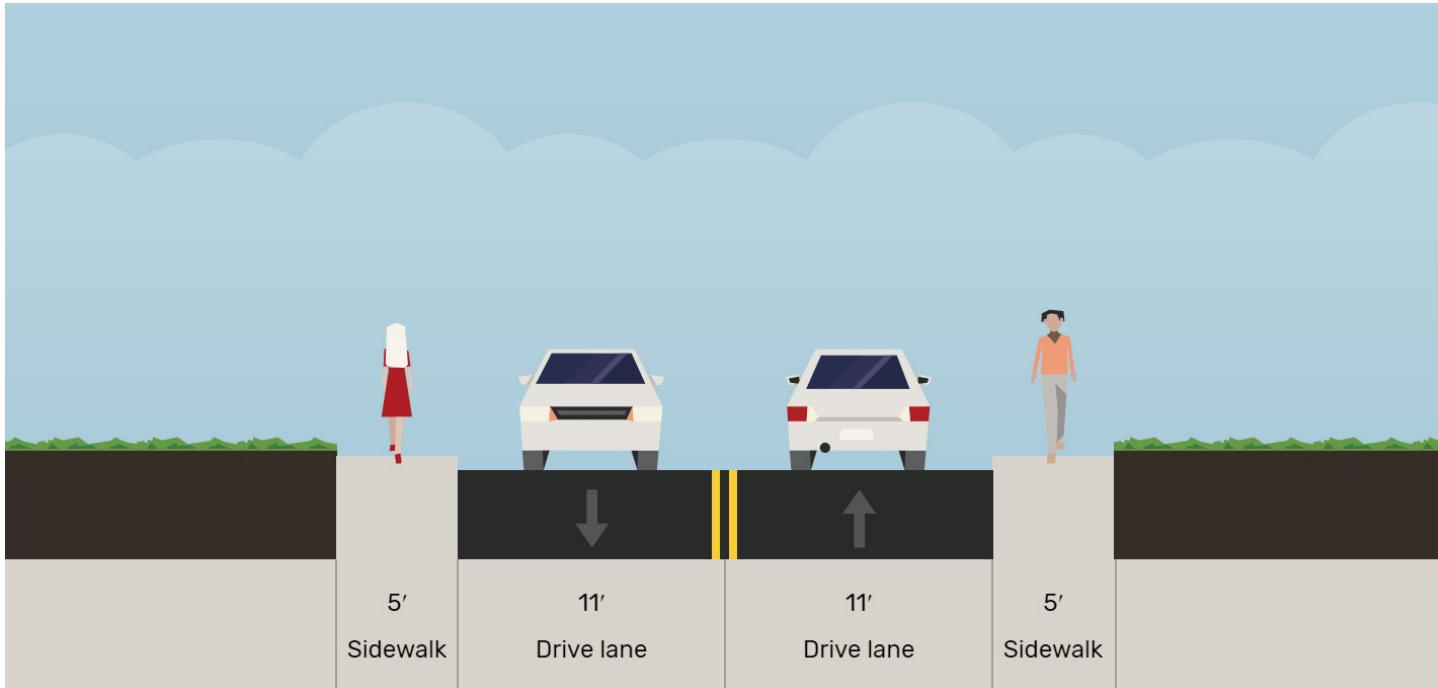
Project D – Cantermill and Bridle Bit Lanes
